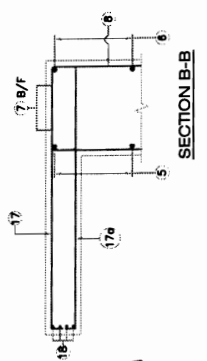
DETAILS OF ABUTMENT CAP & DIRT WALL
